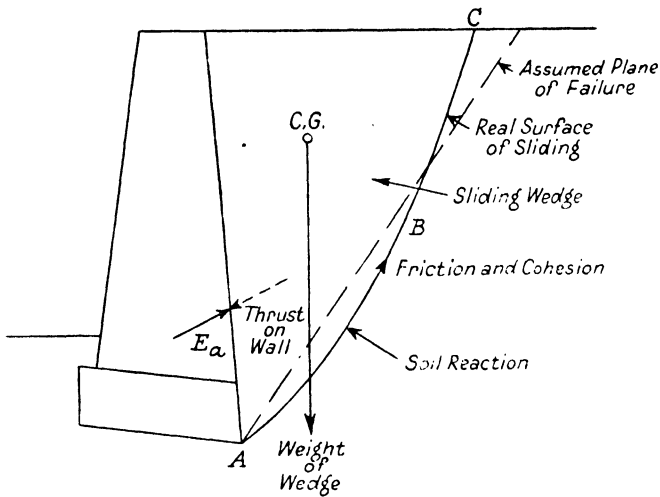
Mechanics of "Active Wedge" of soil behind a retaining wall.
